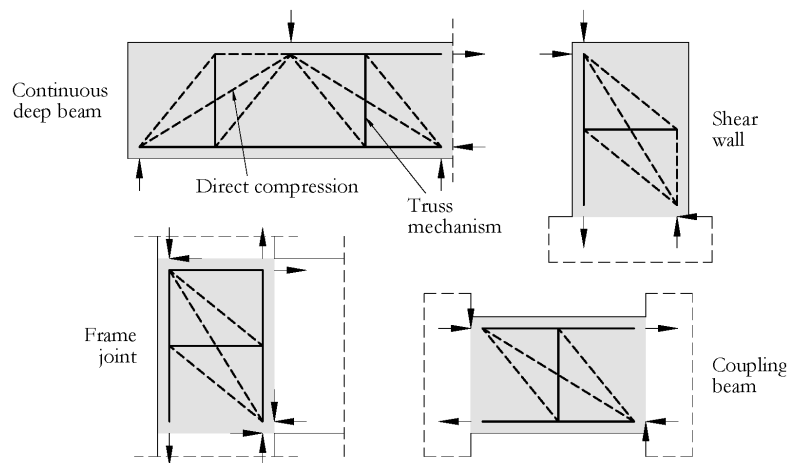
Load-bearing mechanisms of deep beams, coupling beams, squat shear walls, frame joints
